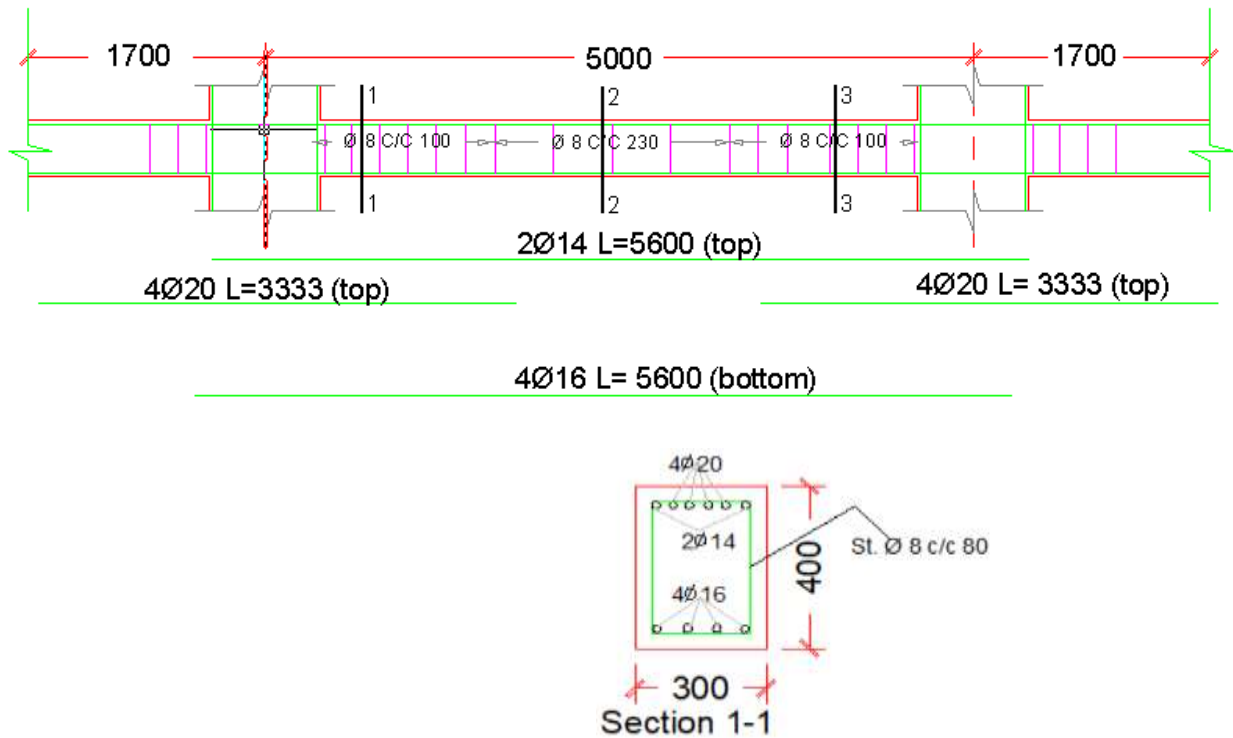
Sample detailing of a beam in DCH 10 favorable model
